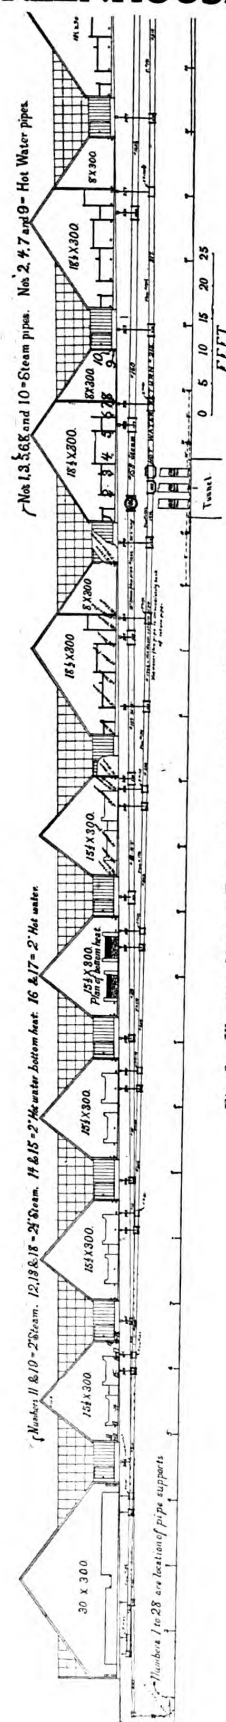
Elevation Showing End of Houses and Heating Pipes.
